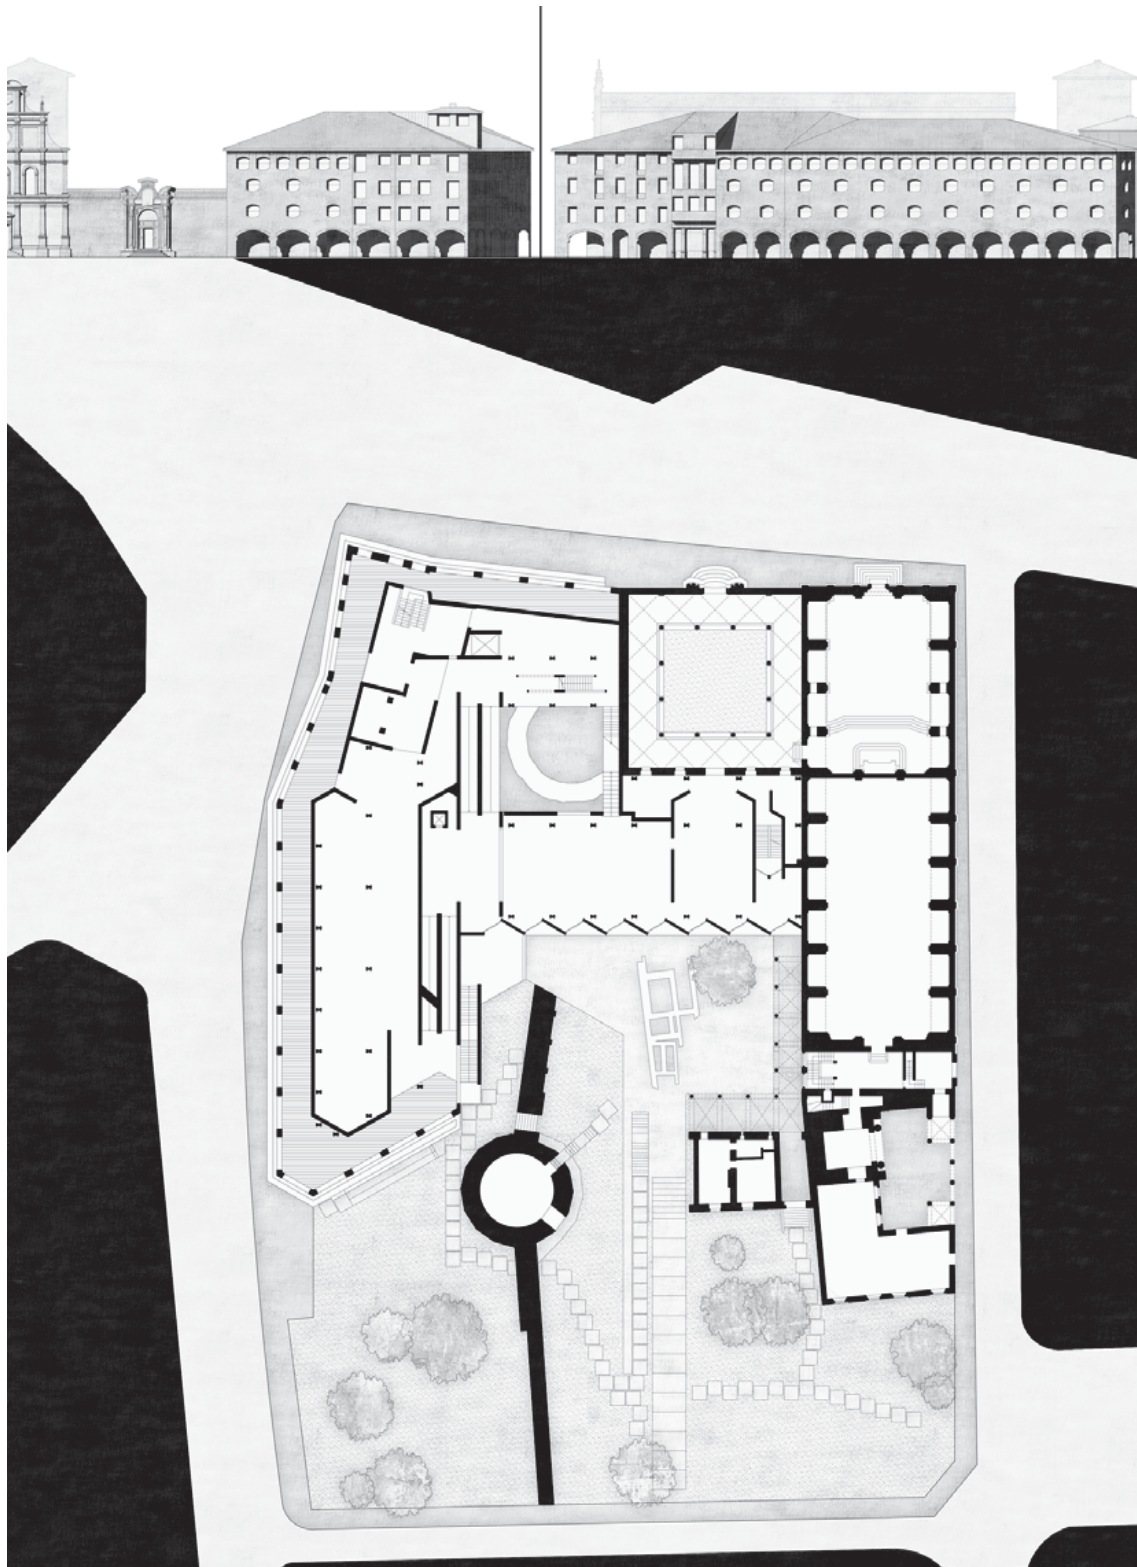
Second project hypothesis (1959-1964): content and container. Ground floor plan, cross section and elevation on via Nirone. Drawing by the author.
